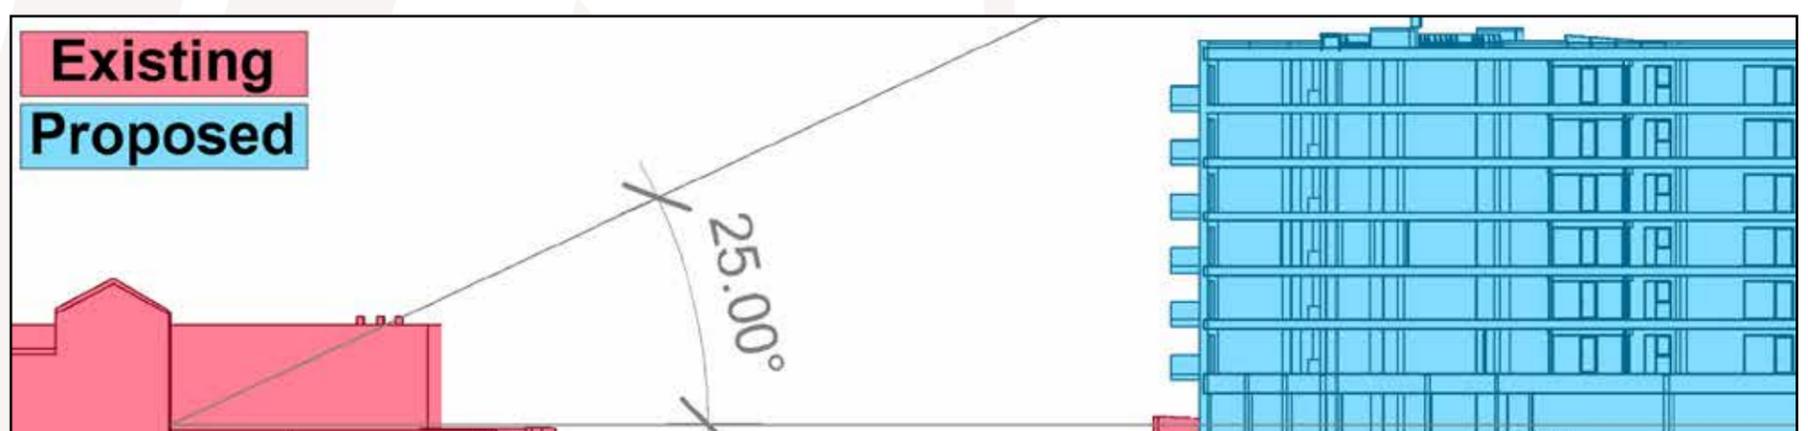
Section B-B taken through #Maro House, Old Blessington Rd
